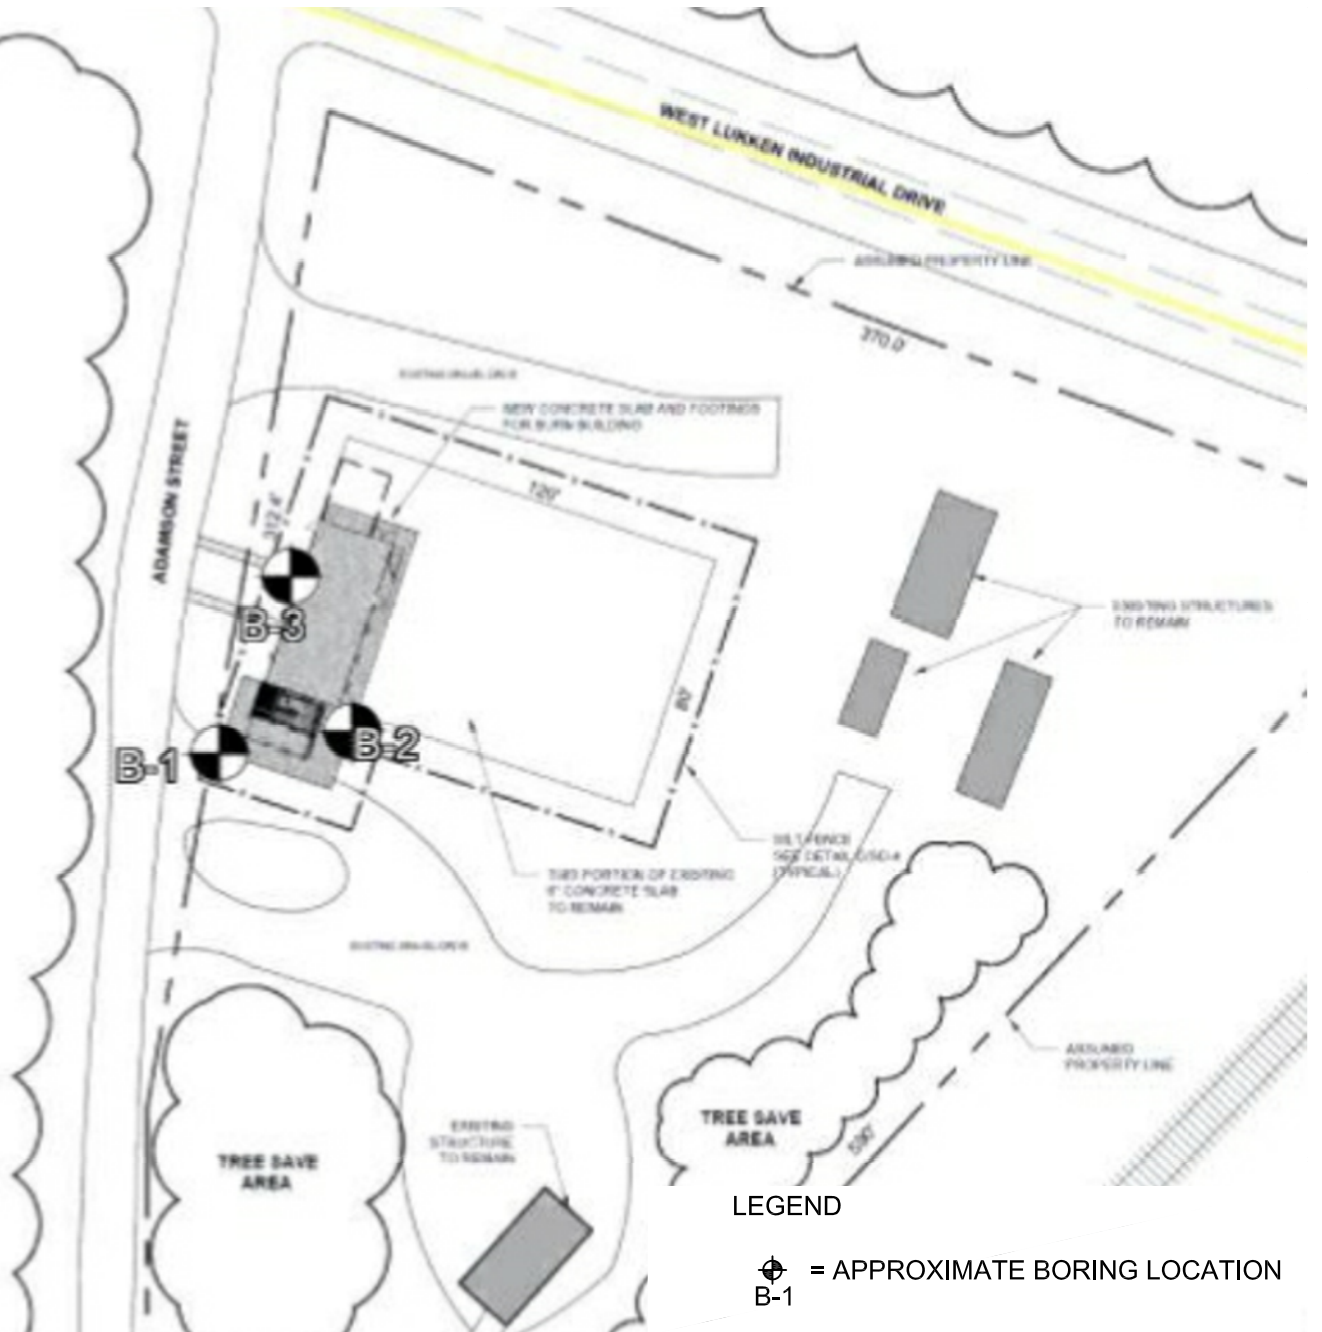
A: BORING LOCATION PLAN WITH PROPOSED SITE PLAN BURN BUILDING & STAIR TOWER LUKKEN INDUSTRIAL DRIVE WEST LAGRANGE, GEORGIA GEC PROJECT NO. 180148.310
